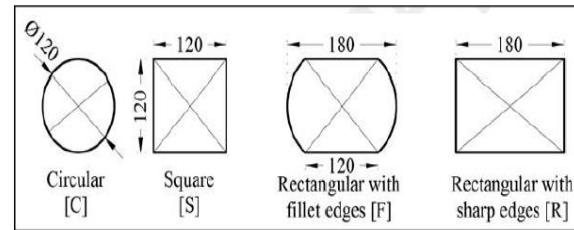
Opening shapes and dimensions (All dimensions in mm) [38].
